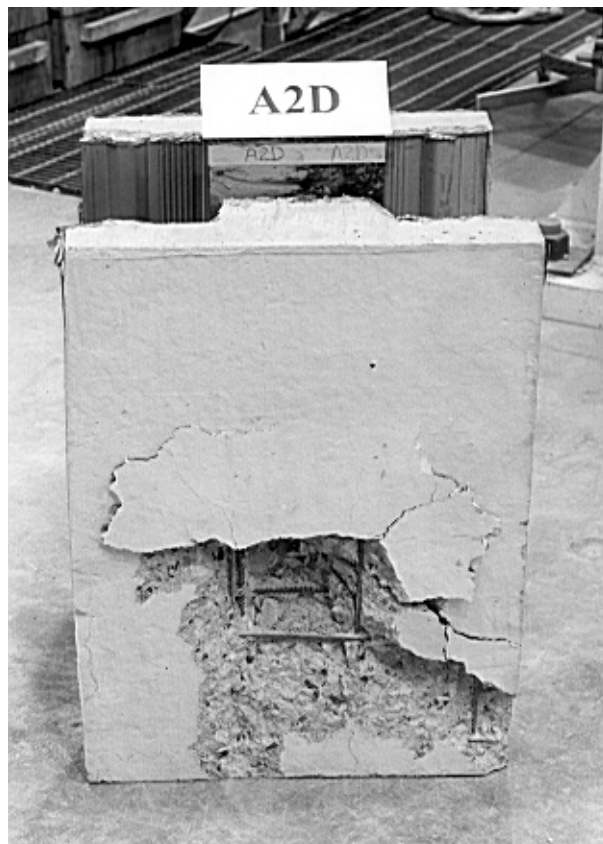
Concrete crushing of deck slab: specimen A2D.
